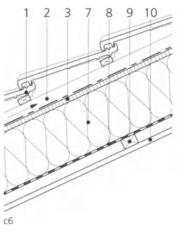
shows the various component layers of a building envelope in tabular form. Figs. c6 and c7 show the layers in more detail for the roof and external wall constructions.
